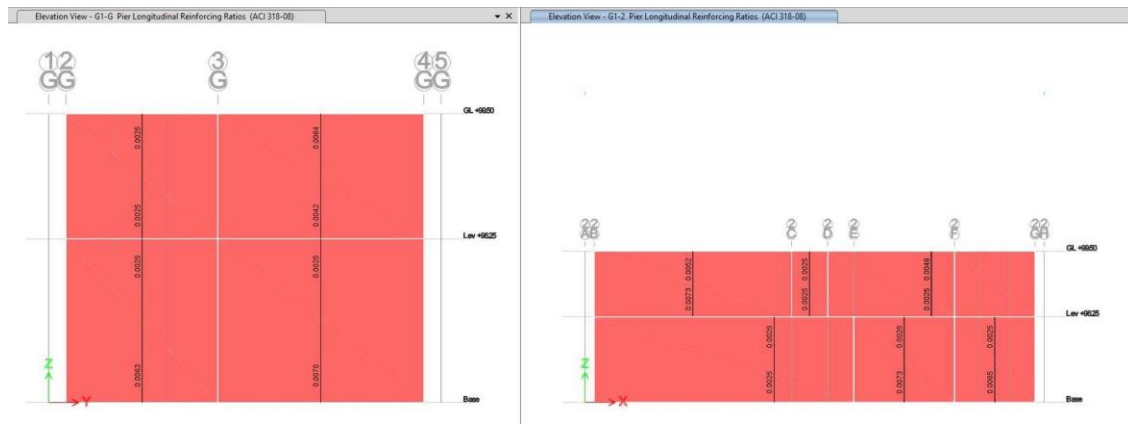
Pier Reinforcing Ratio of Exterior Wall
